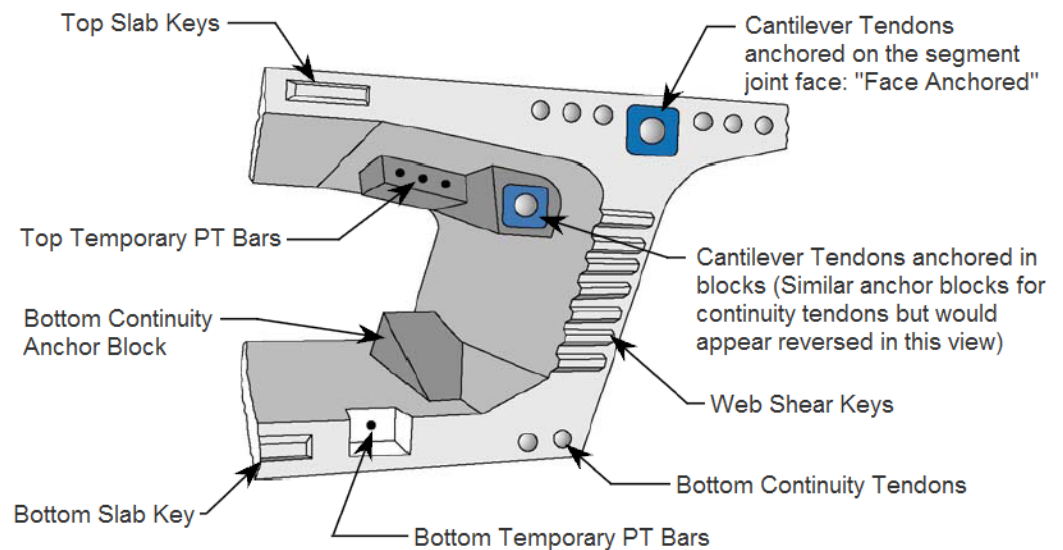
Typical Features of Precast Cantilever Box Girder Segments
